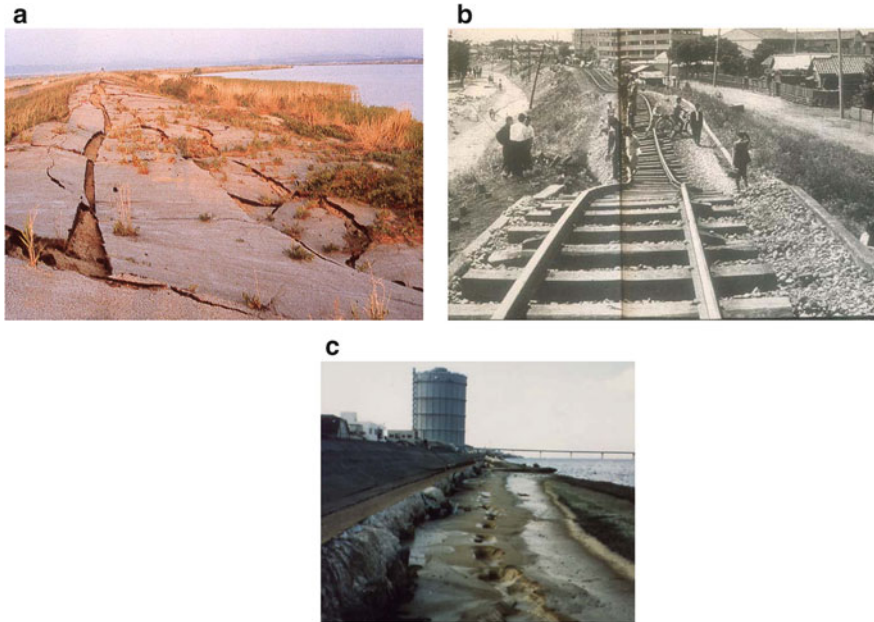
Damage to earth structures. (a) Sliding and subsidence of polder dike (1983 Central Japan sea earthquake). (b) Sliding and subsidence of railway embankment (1964 Niigata earthquake). (c) Sliding of Yodo River levee (1995 Kobe earthquake)
